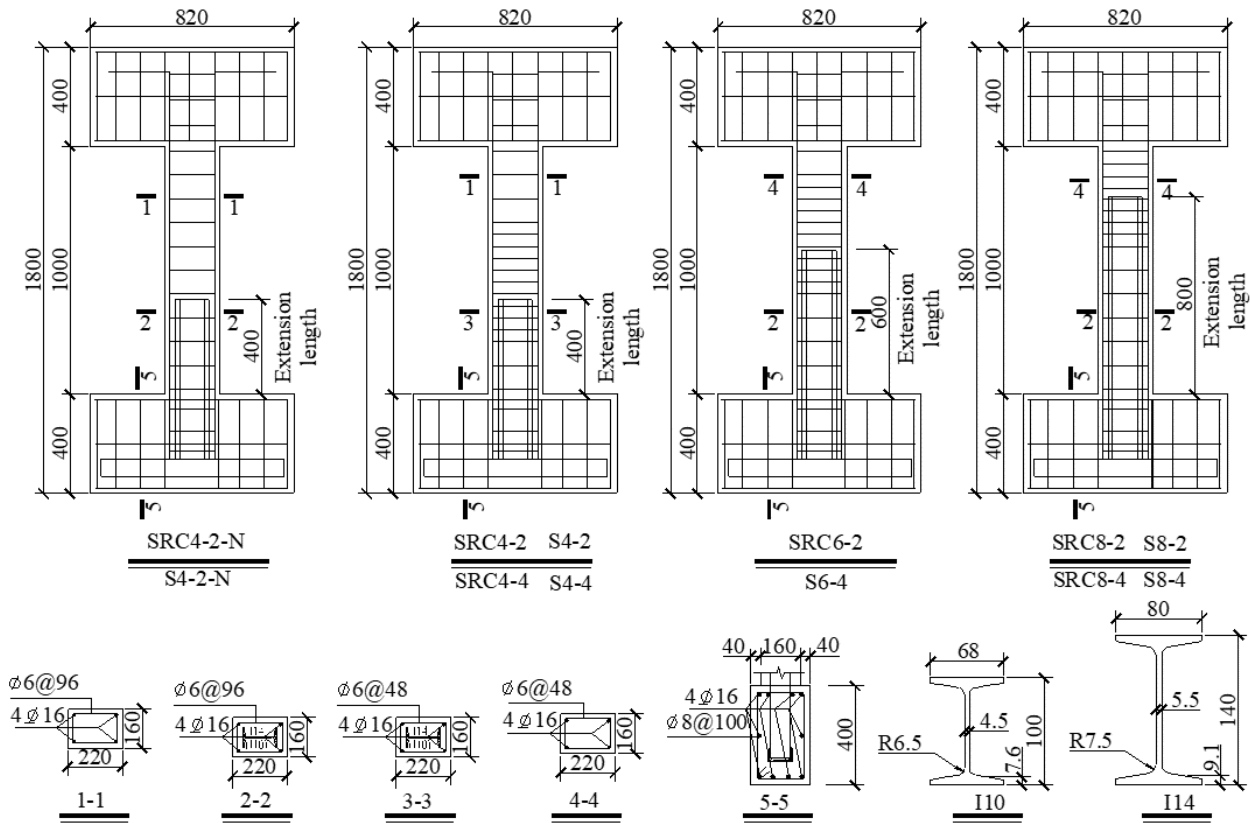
Steel reinforcement arrangement and section dimensions of the shape steel (Measures in mm)
